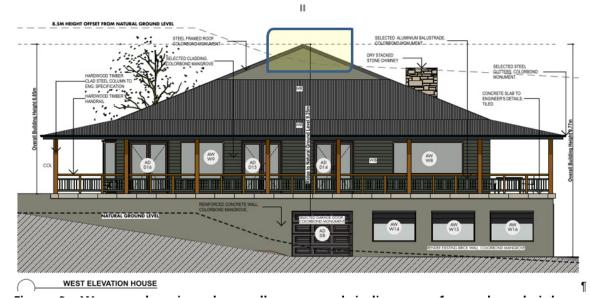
Western elevation where yellow rectangle indicates roof area above height limit.
